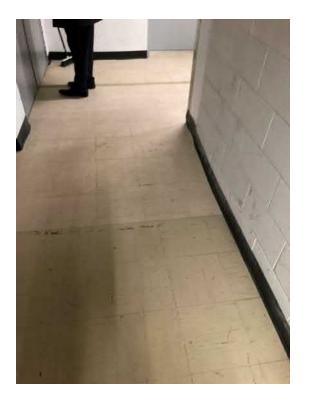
Basement interior showing VFTs and transition from original portion of building to 1985 addition
